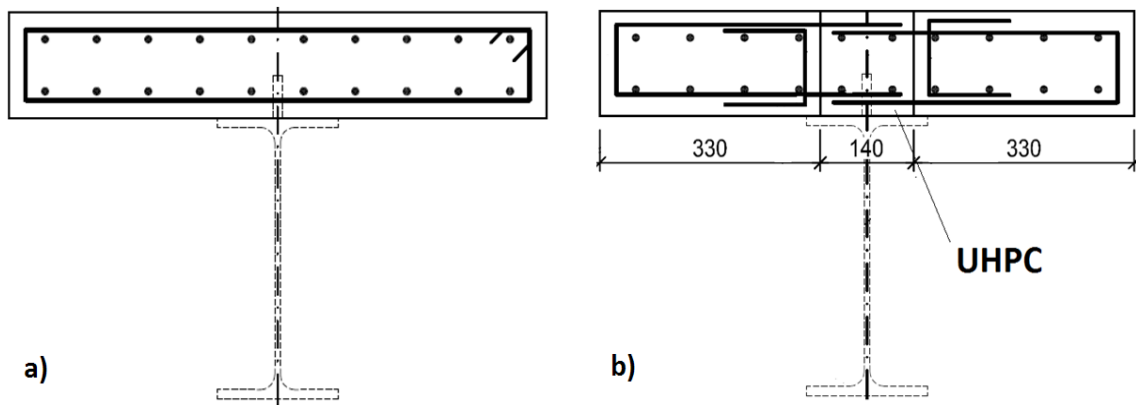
Cross-section of the beams a) cast in situ slab, b) precast slab with the joint
